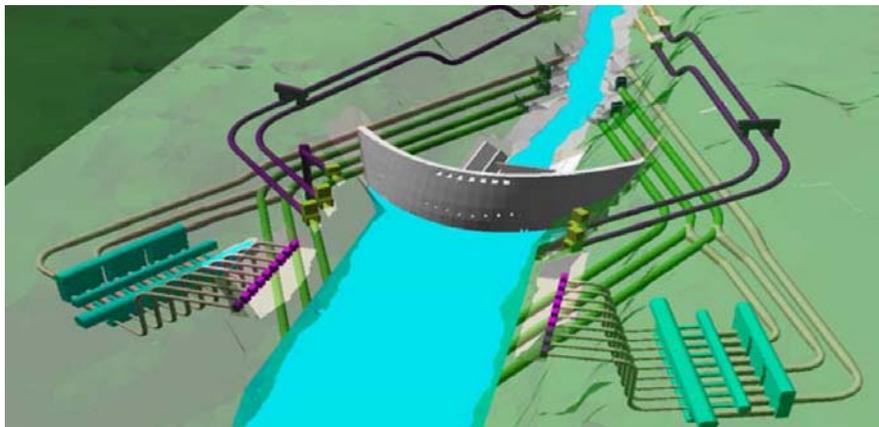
Layout of the 285.5 m high Xiluodu arch dam with underground structures and world's largest powerhouse caverns (one underground powerhouse on each bank of the reservoir; location: Jinsha River, China; installed capacity: 13.86 GW)
